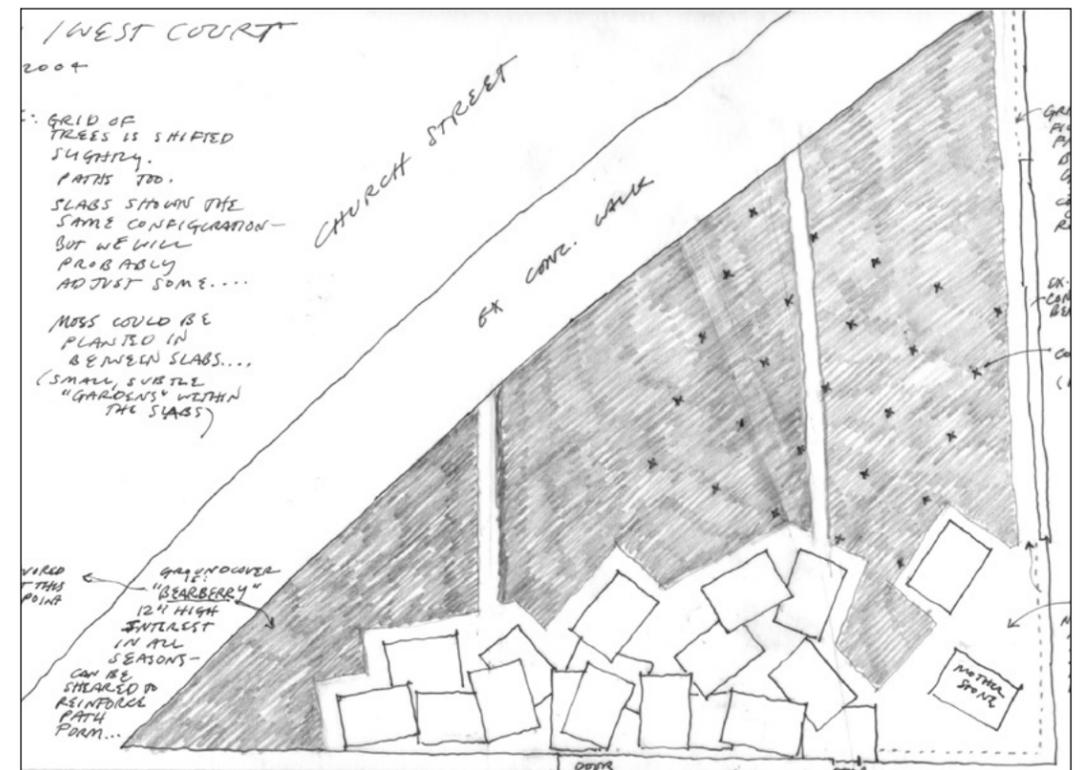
West Garden, Rapson Hall, study for elements of proposed, *Site Index*, installation of anorthositic gabbro slabs and landscape elements, Rebecca Krinke, detail, pencil sketch, 2004.
